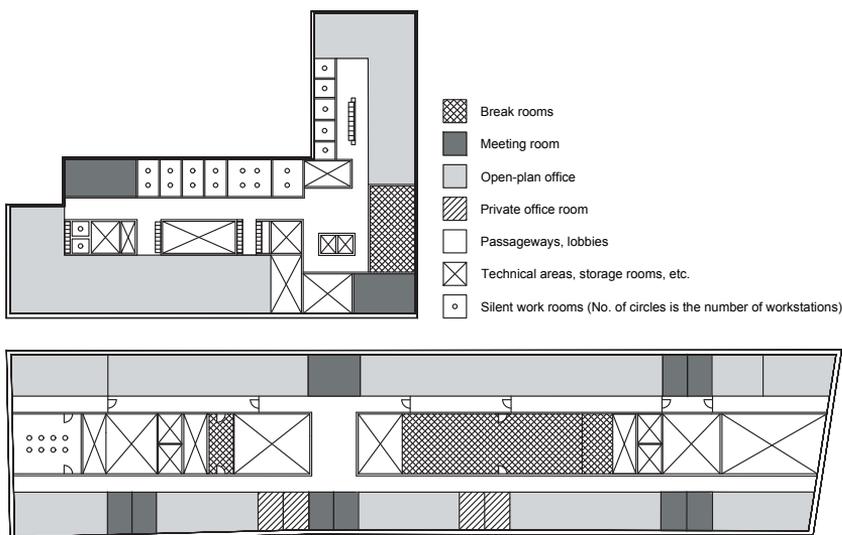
Floor plans of Organizations A (above) and B (below) after the relocation (Time 2). The floor plans represent one of several floors. Mutual dimensions are in scale.
